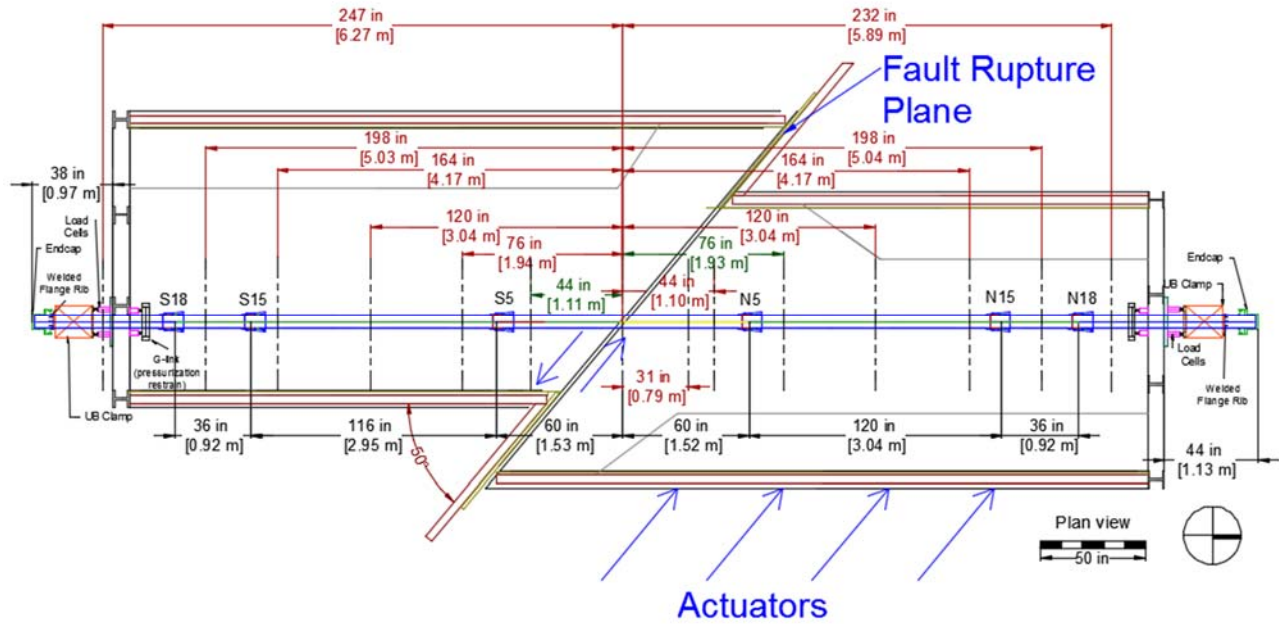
Plan View of Kubota ERDIP Pressurized Pipe Centered Specimen in Test Basin
